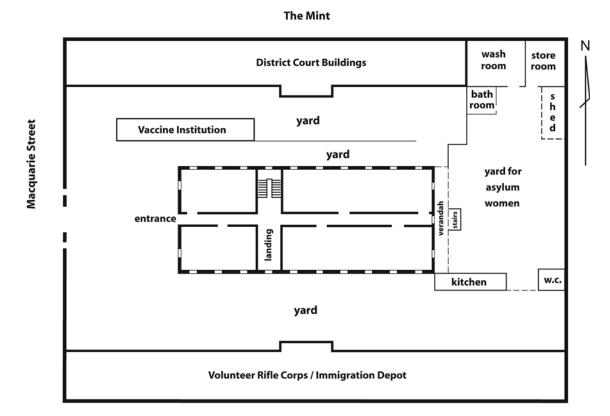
Simplified plan of Hyde Park Barracks, around 1870. (Drawing by author, 2008.)
